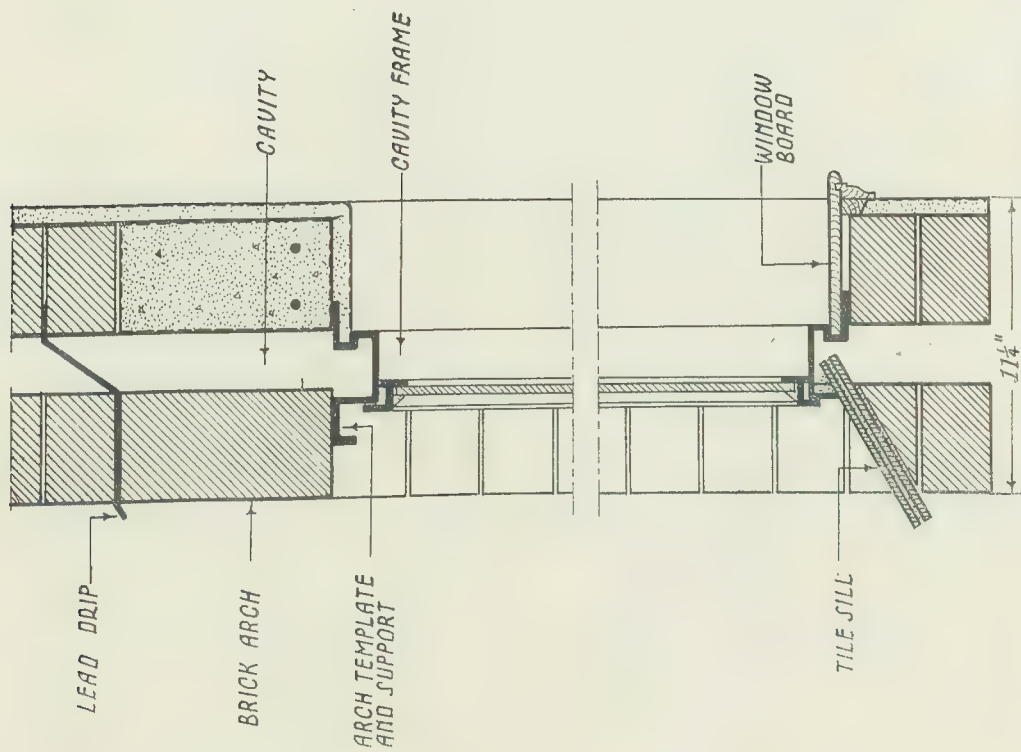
SECTION THROUGH WINDOW OPENING IN A BRICK CAVITY WALL SHOWING "CAVITY" METAL WINDOW FRAME
